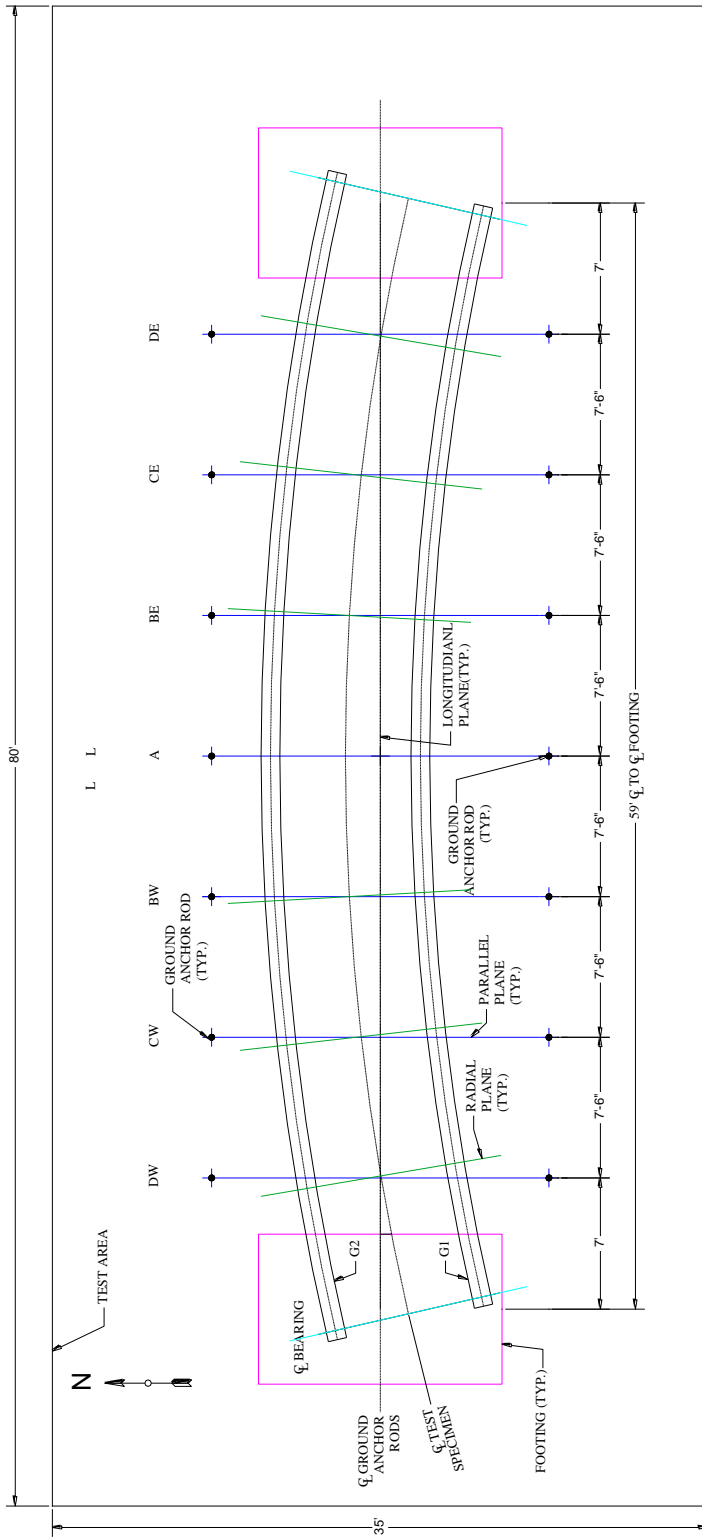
Plan view of test setup area (Sause et al., 2012)
